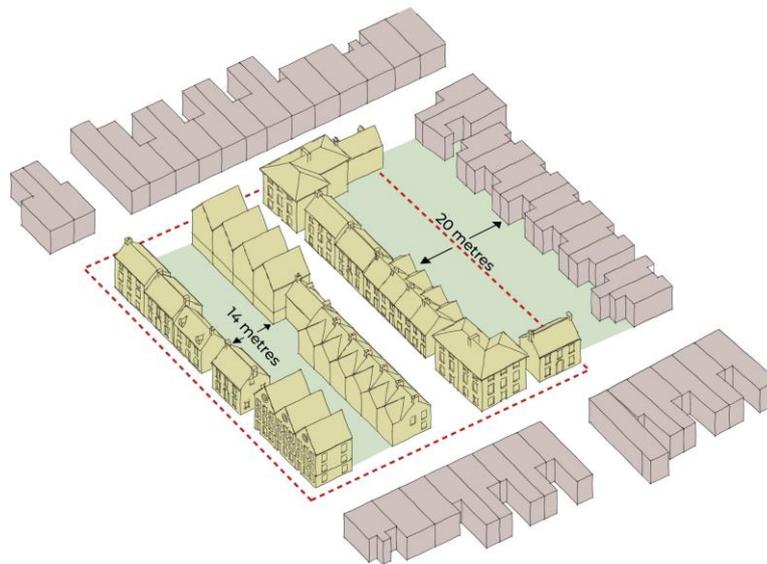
Diagram of a new Urban Neighbourhood, where the back-to-back distance is 14m between new buildings and 20m to existing buildings
